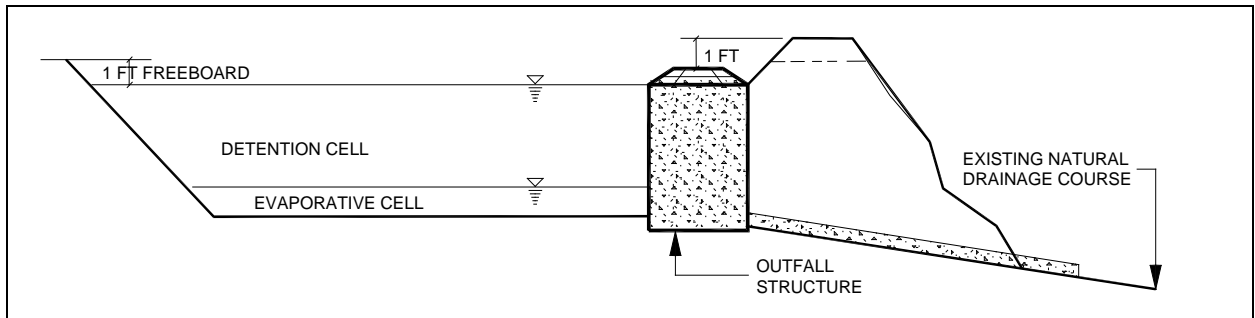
Separated Evaporative/Detention Facility Cross-Section
